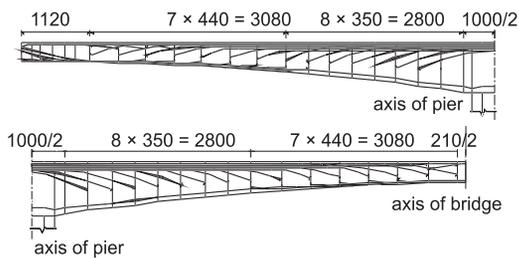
Layout of the internal prestressing system of the left-deck bridge, cm
